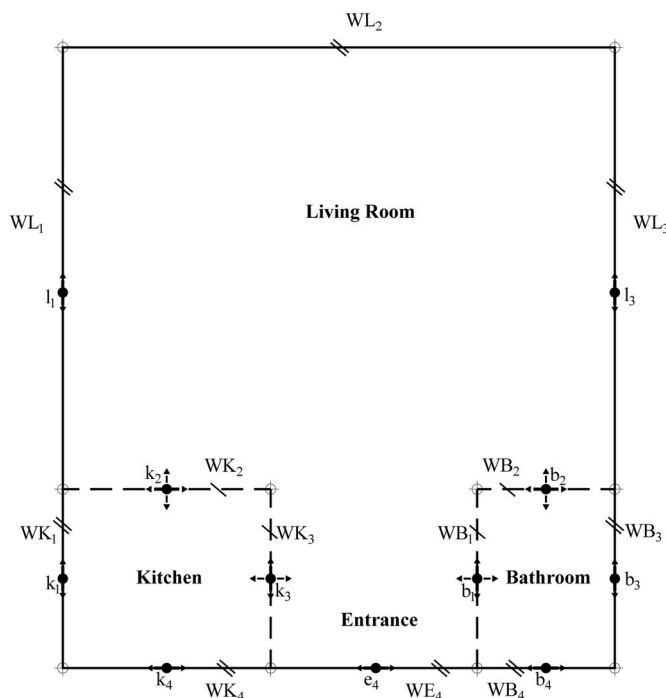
Simple plan layout of the THU, including sliding walls, directions, and dependent walls.
